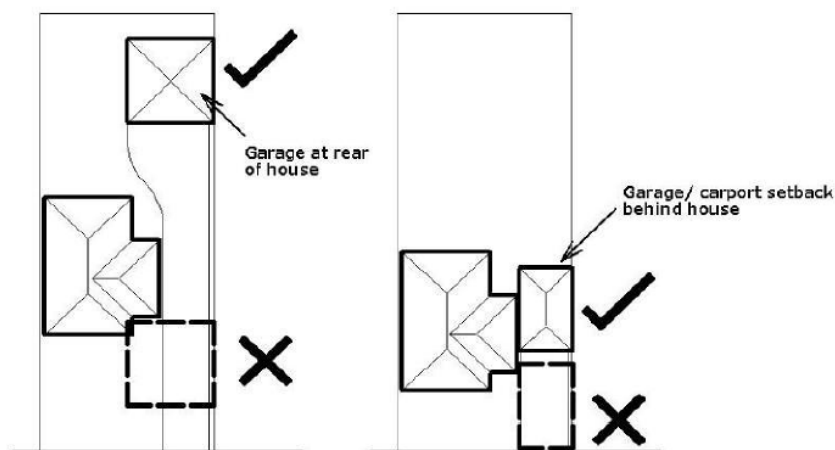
Consider the location of the proposed structure in relation to the principal building, boundaries and other details of the site
